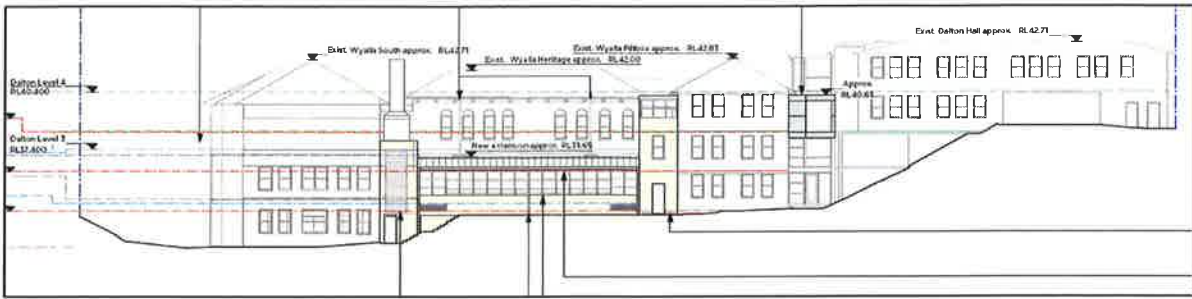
| Senior Campus – Proposed Eastern Elevation (Source: Applicant’s EIS 2018)
